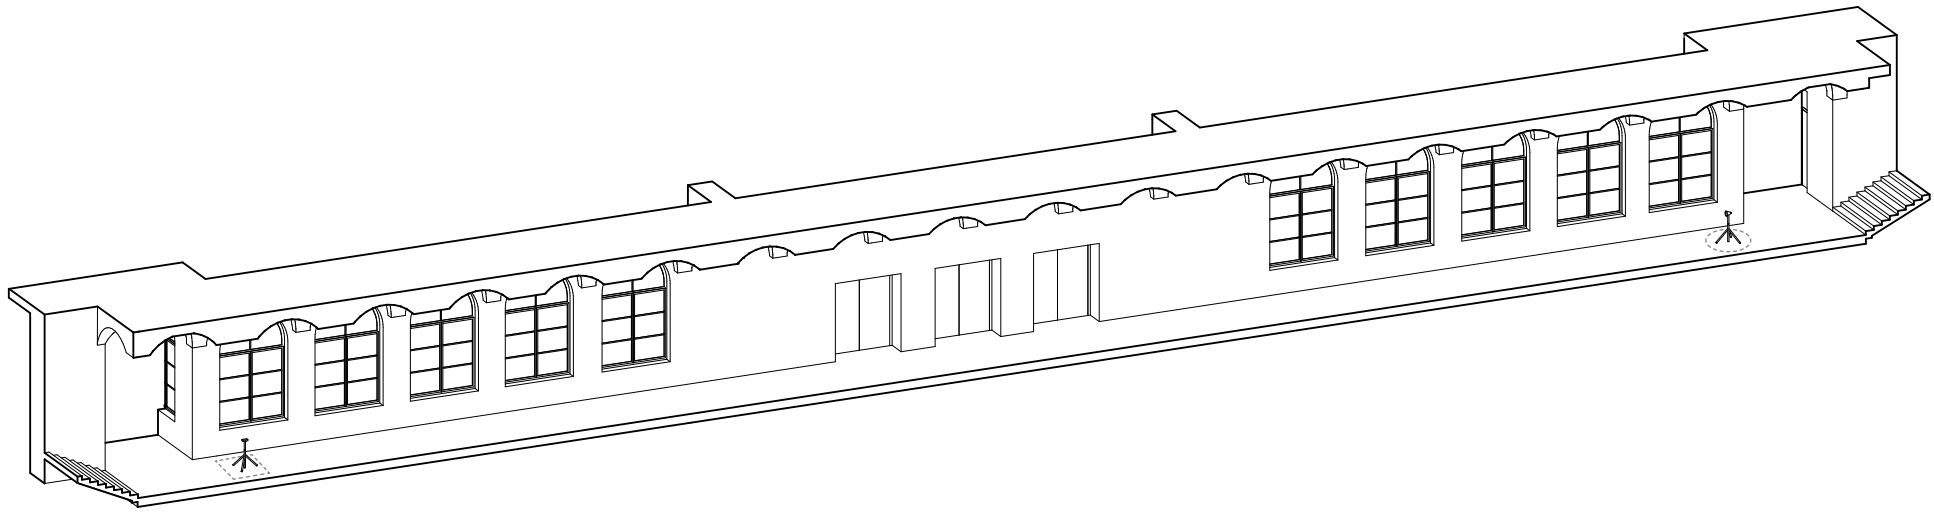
floor plan of a long corridor (scale 1:300), 1. Floor
